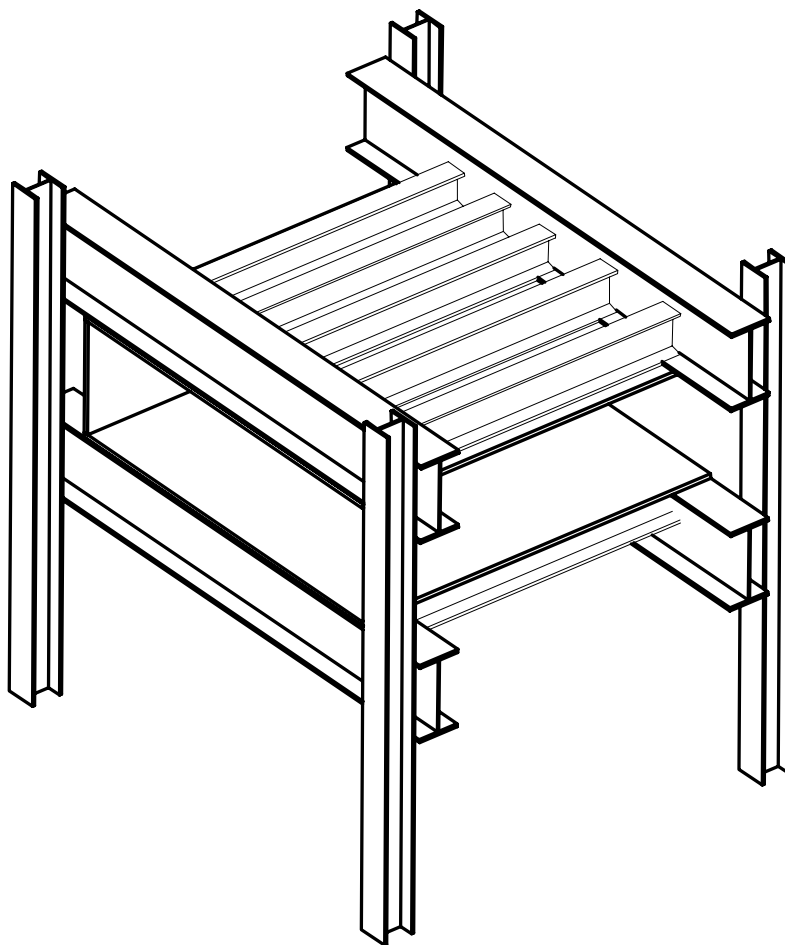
Schematic of tank construction (hoist beams omitted).
